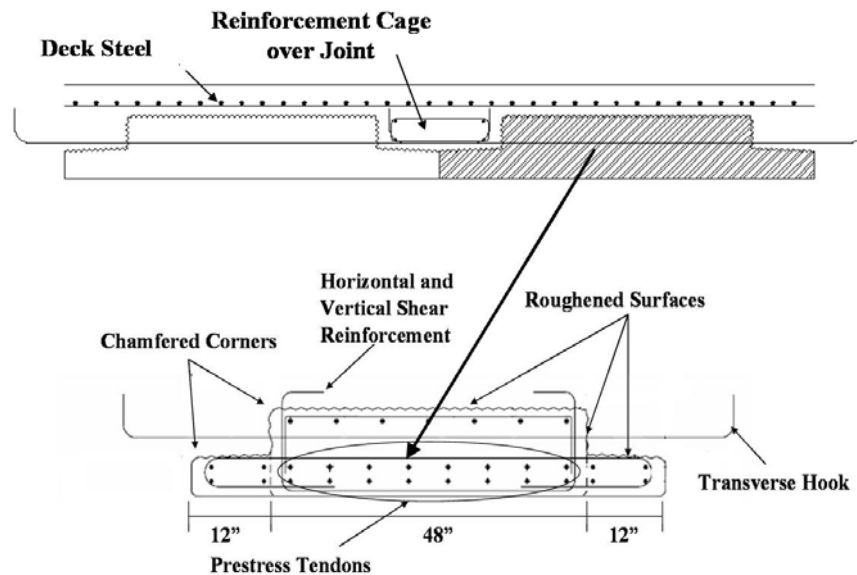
Conceptual cross section of Mn/DOT Precast Slab Span System
